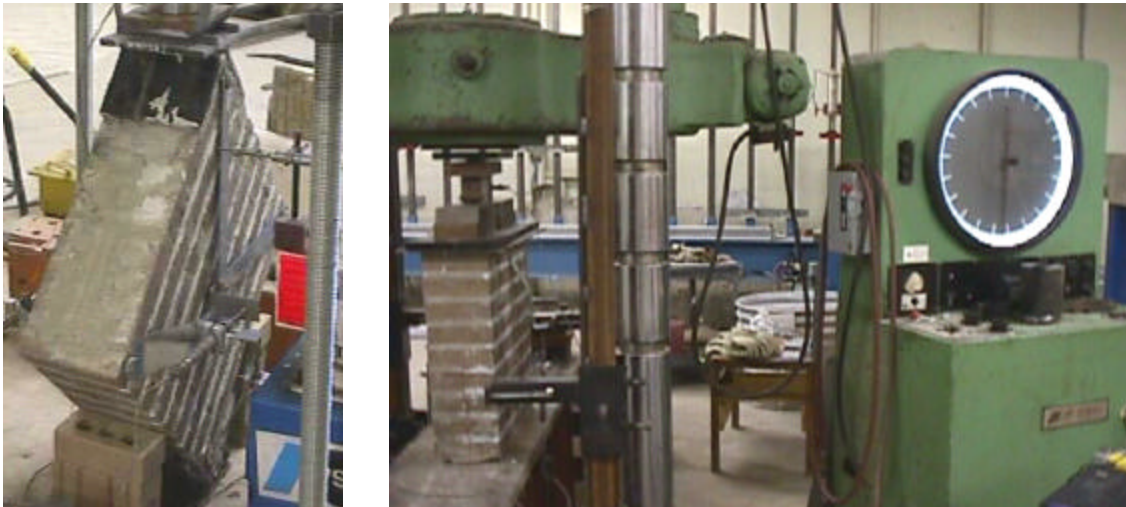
FRP-Structural Repointing reinforced double-wythe wall subjected to diagonal and axial load testing.
